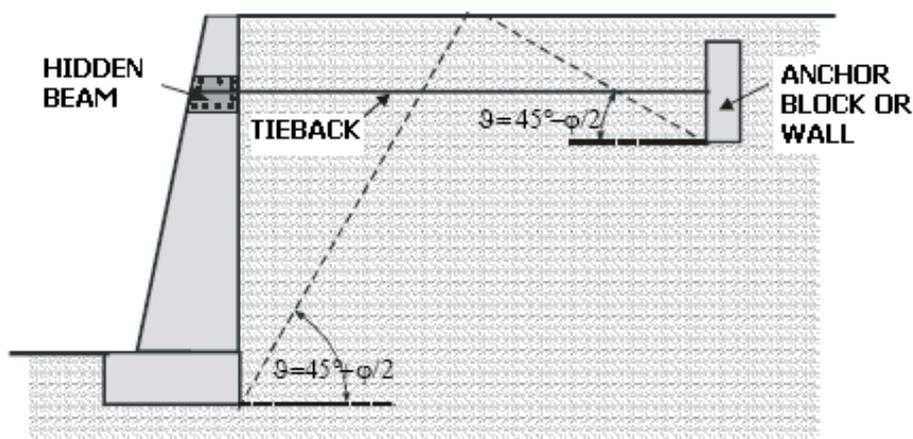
Cross-section of a concrete retaining wall with steel tieback
